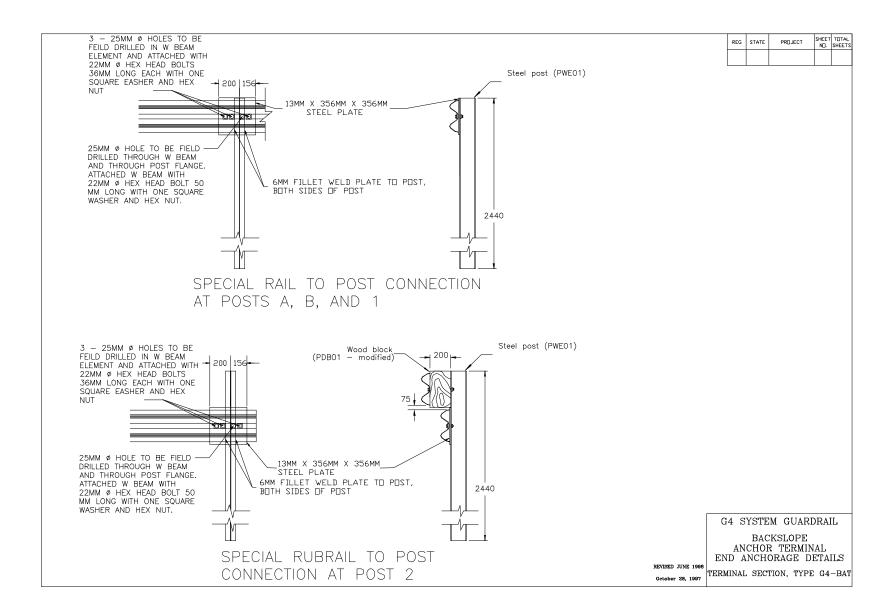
Details of the G4 W-beam guardrail buried-in-backslope terminal installation for 404211-1 (continued).
